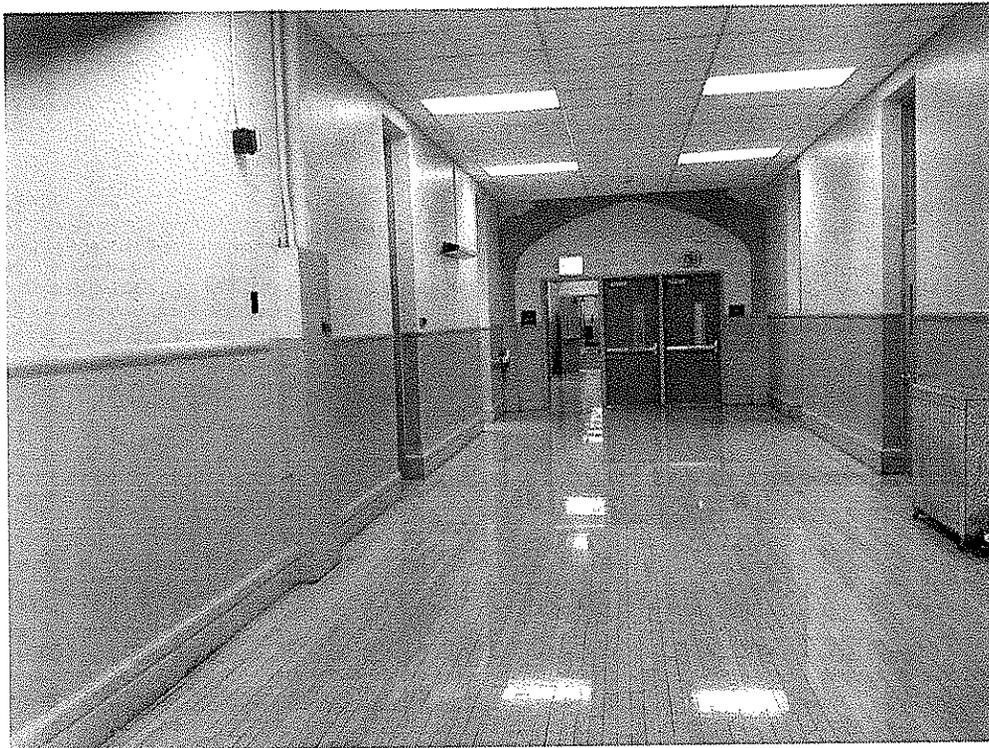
Third floor hallway. The plaster walls shown in this photo are typical of the original 1909 area of the building. The wall area below the wainscot contained lead paint. No asbestos was detected in the wall plaster and 2' x 4' suspended ceiling tiles.
